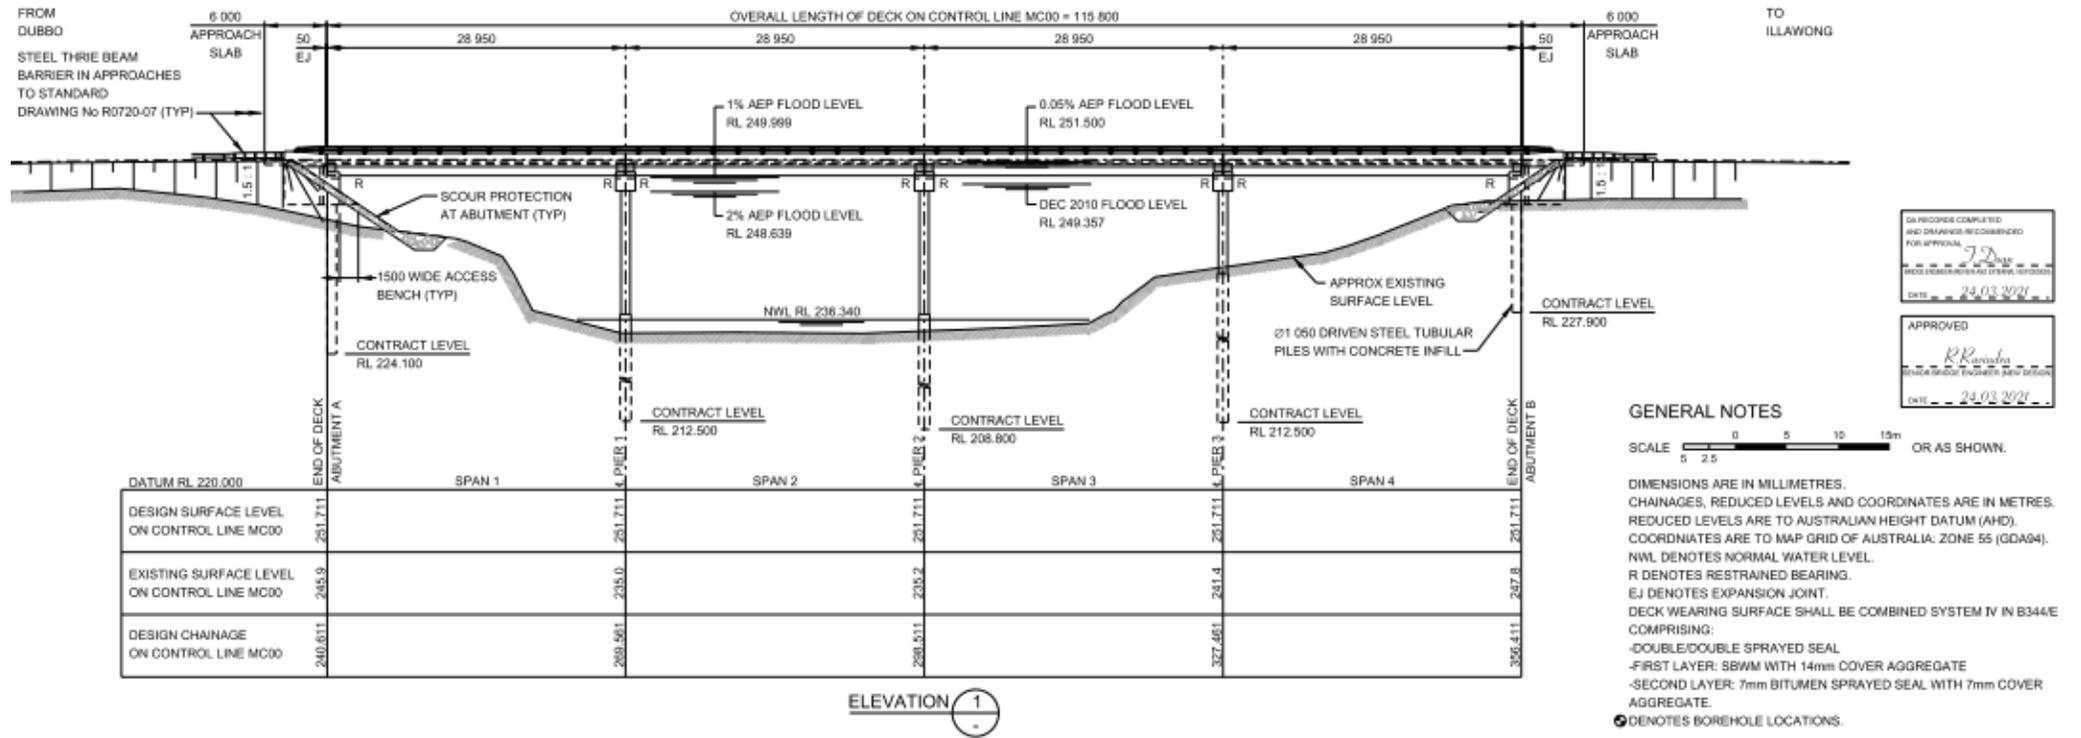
Typical long section of the new bridge (TfNSW Concept design)
